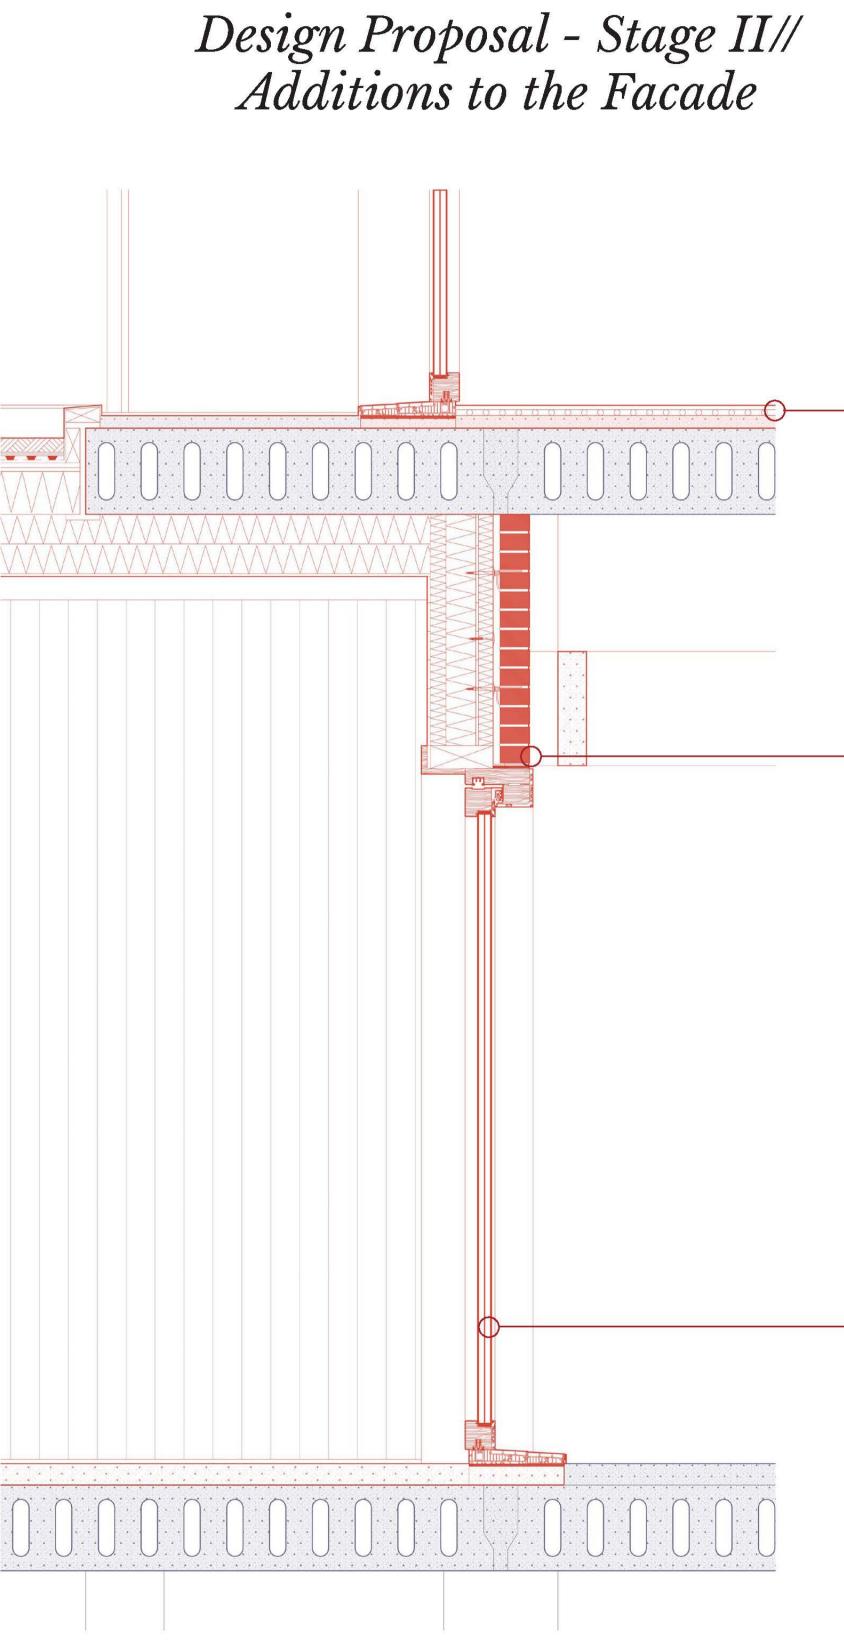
(Up) New Ground Floor Walls. Fig. 14. (Left) Proposed Modifications to Existing Facade.
